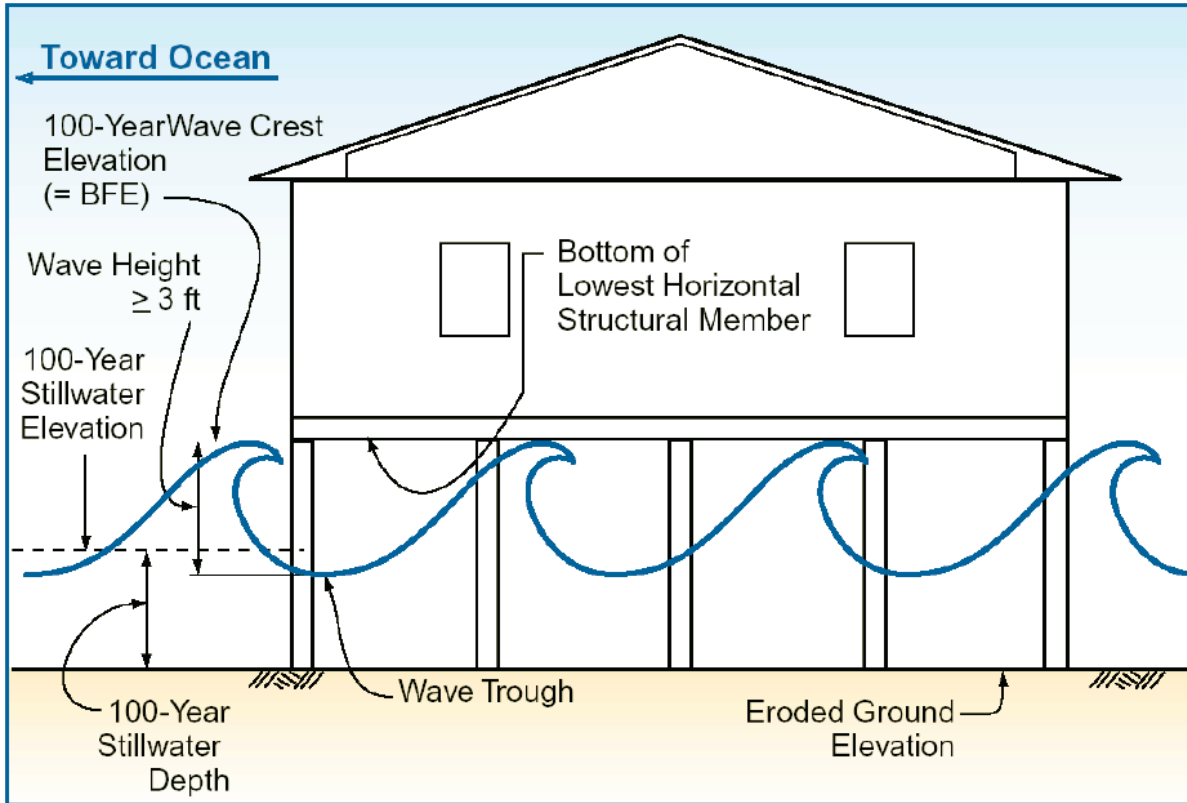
National Flood Insurance Requirements for the V-VE (Wave) Zone (From FEMA CCM). Under the National Flood Insurance Program, structures must be elevated above the Base Flood Elevation on piers and columns, posts or pilings.
